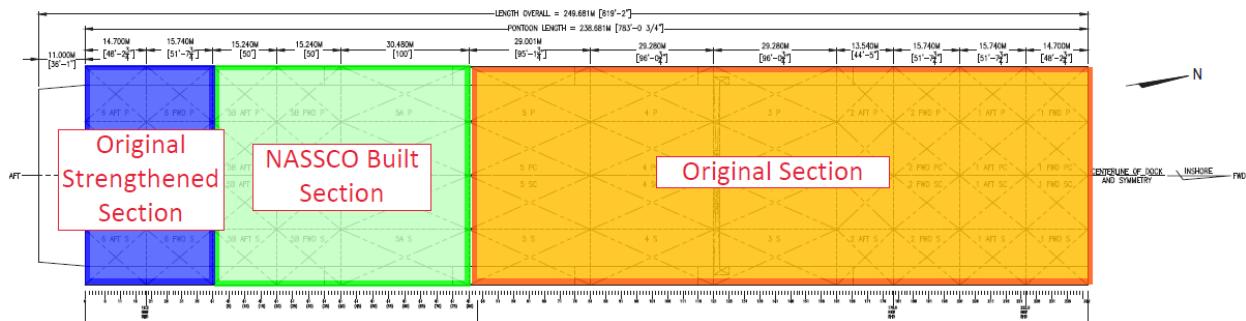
PLAN VIEW OF BUILDER FDD
